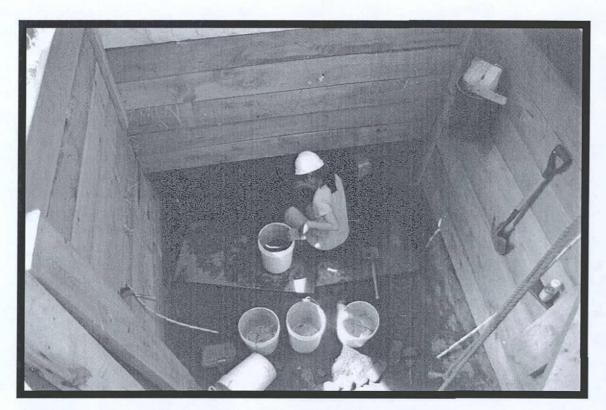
Timber Shoring for Excavation of Shaft Feature.
